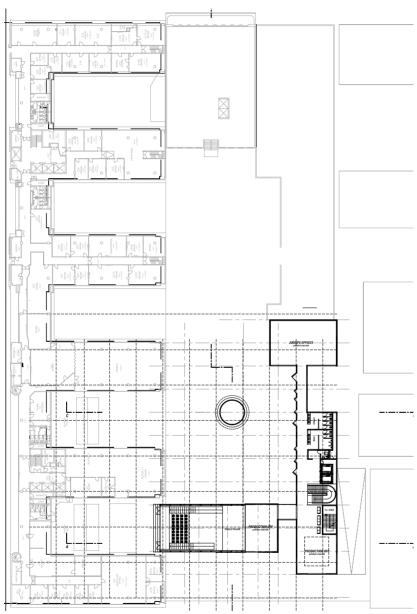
14 - Second Floor Plan NTS (Source: Author. 2013)
